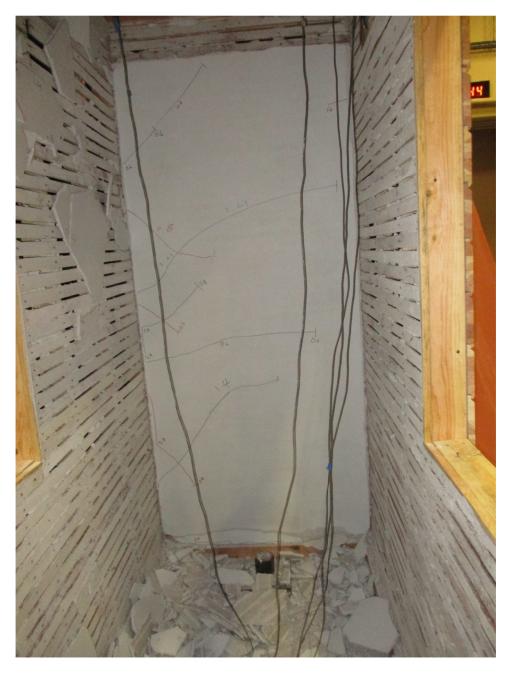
Plaster cracked but still intact at the east end wall. Note piles of plaster debris on the floor.
